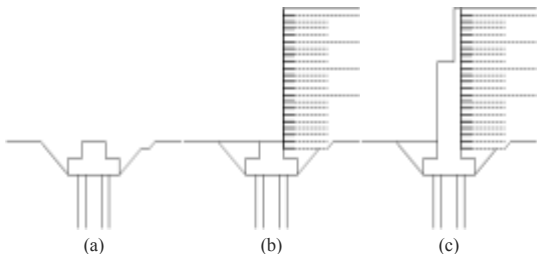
Procedures to construct RAR (a) Foundation (b) Backfill (c) Abutment
